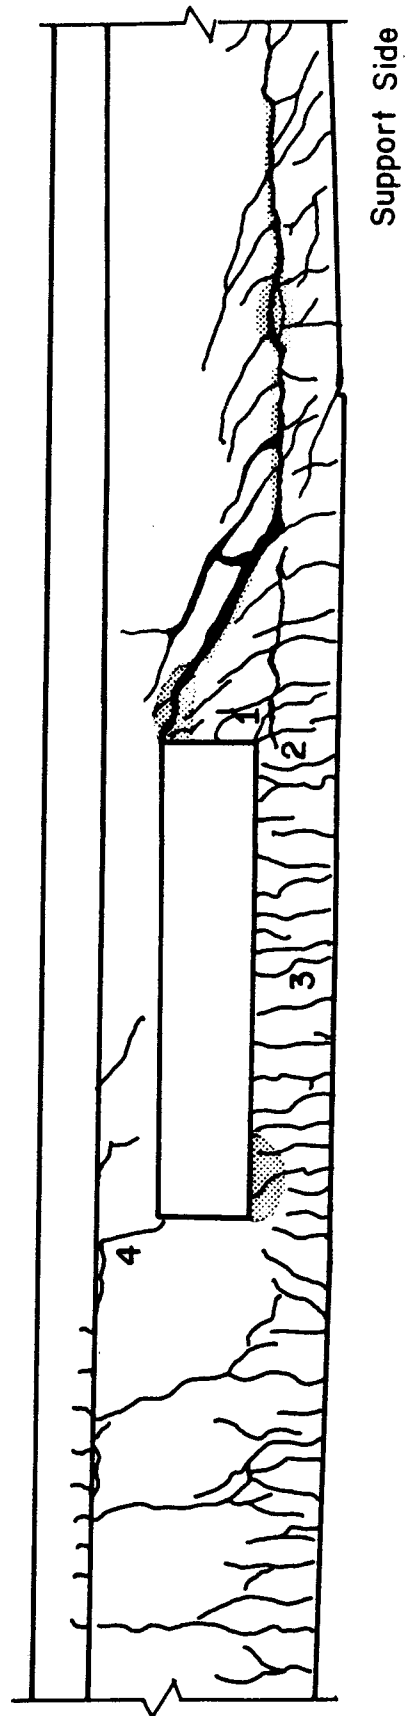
Crack Pattern - BEAM C2.
